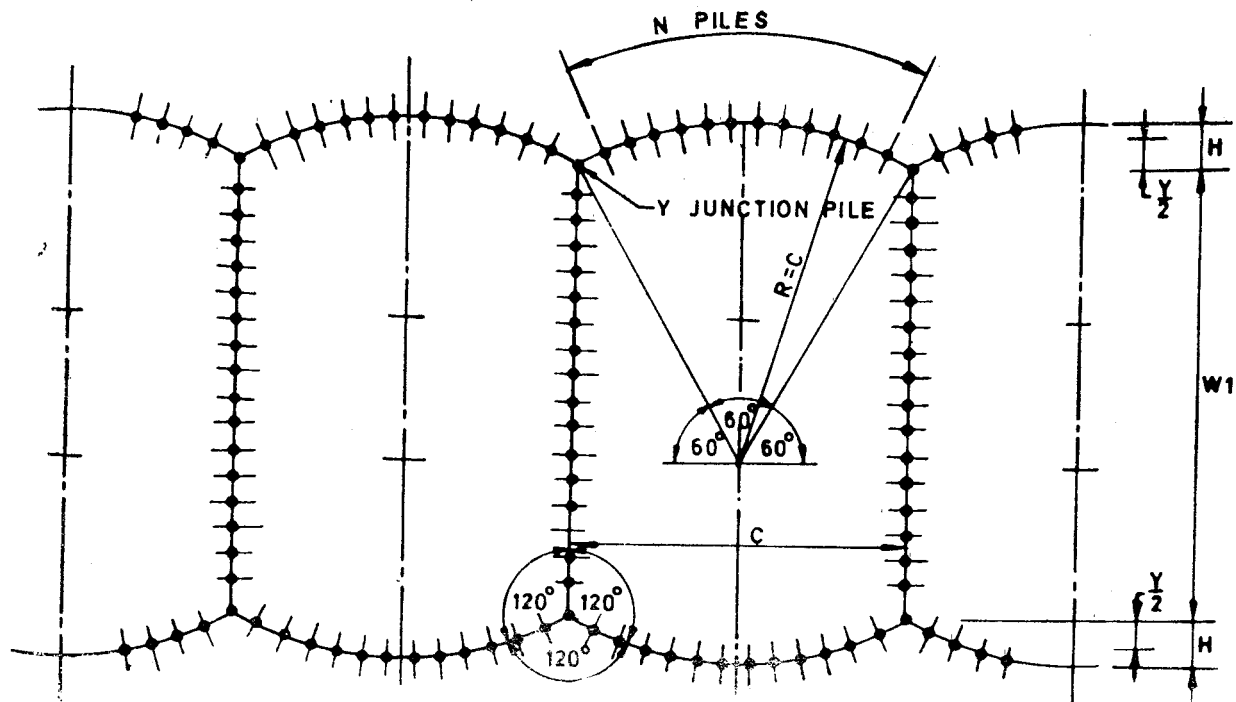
DETAILS OF LAY OUT OF DIAPHRAGM TYPE SHEET PILE CELL
